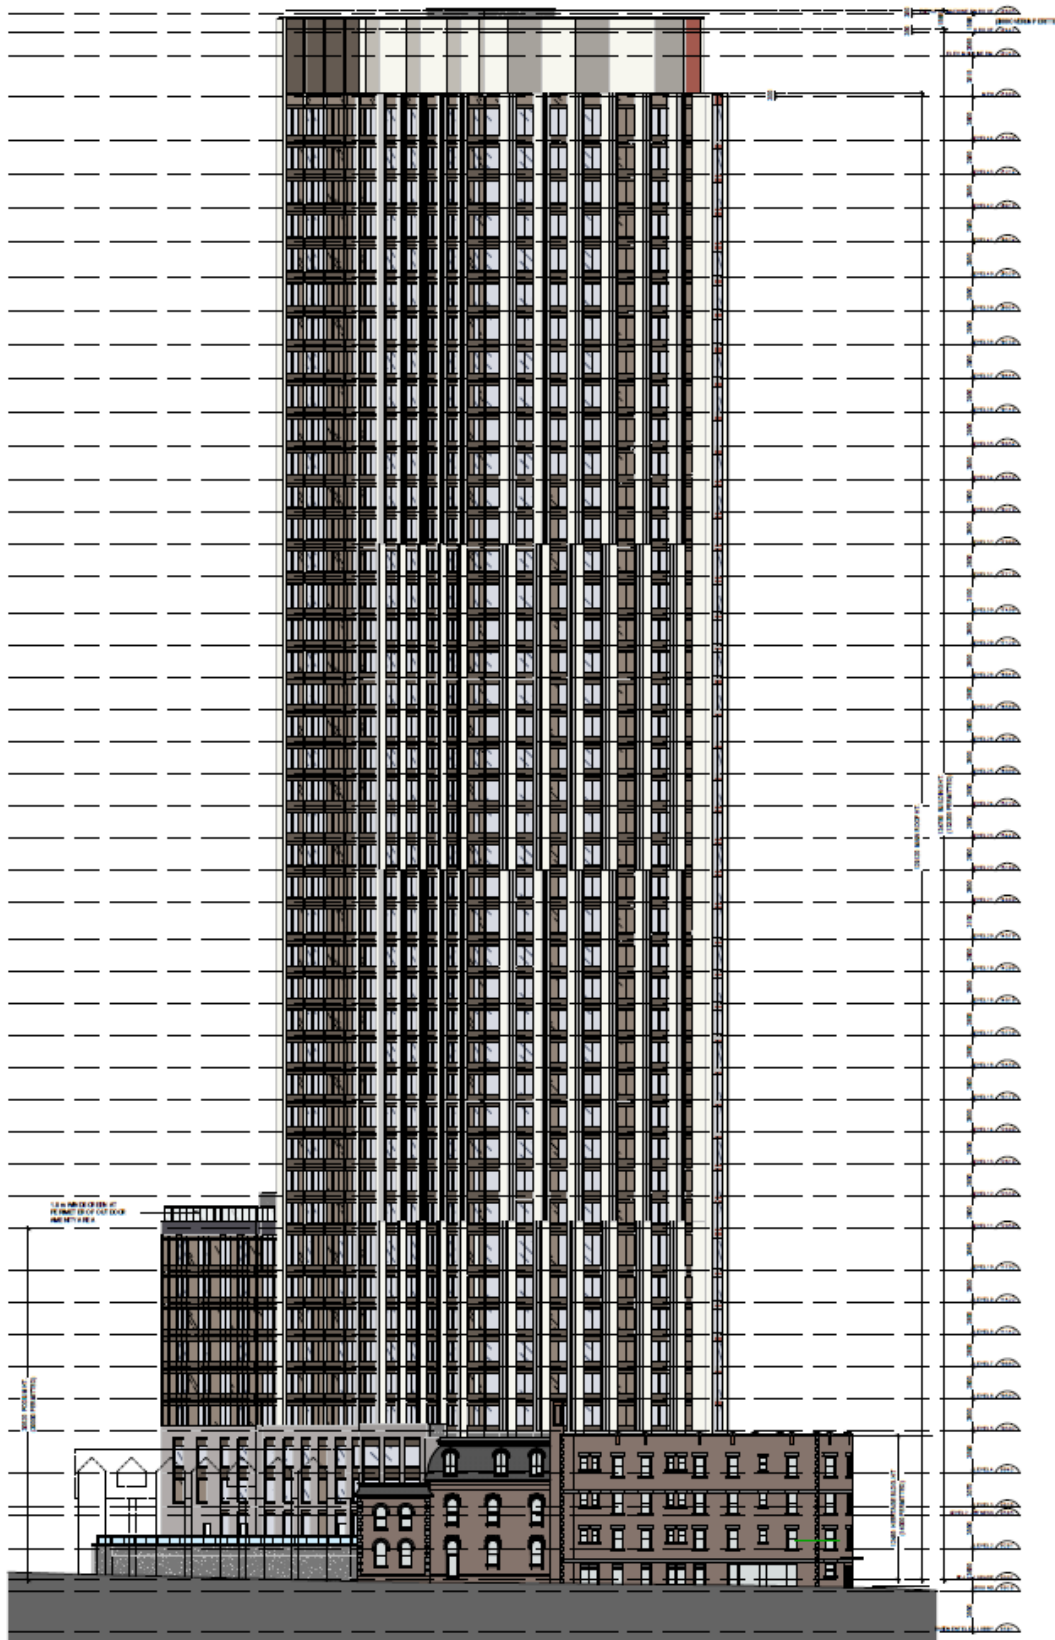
Proposed west elevation of 212 Dundas Street East included for illustration purposes (Rafael & Bigauskas Architects Inc., February 23, 2026).
